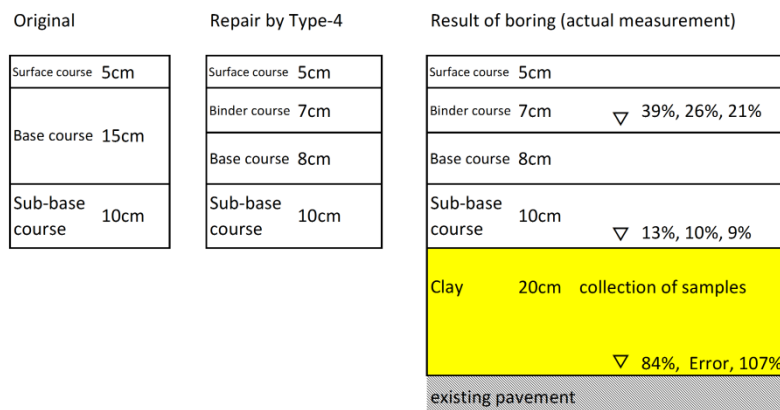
Excavation Cross Section (Sta.6+904)
